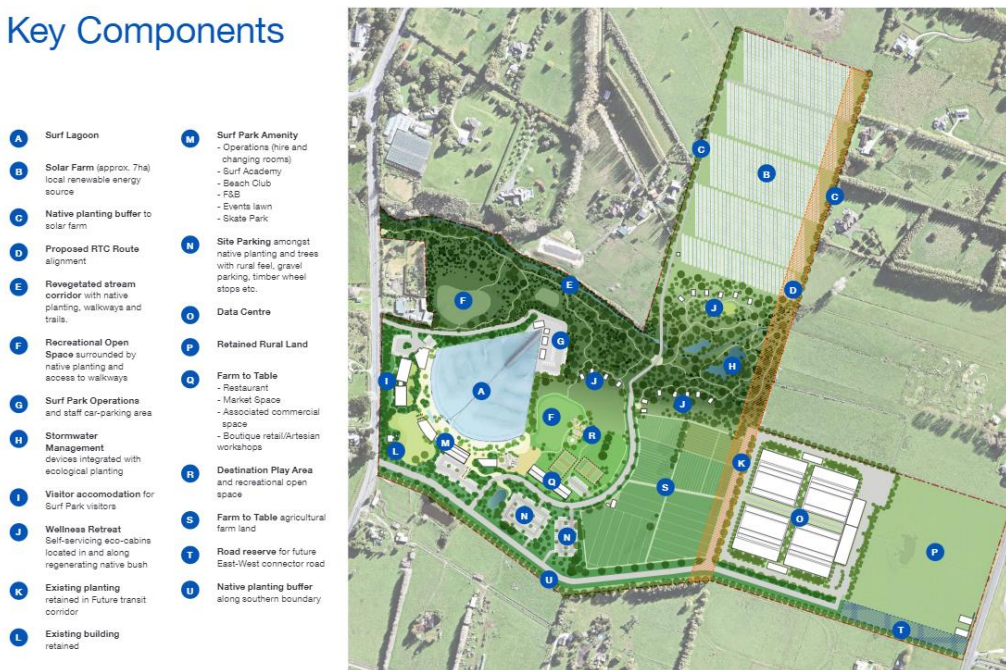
Masterplan illustrating the activities proposed and the site layout.
